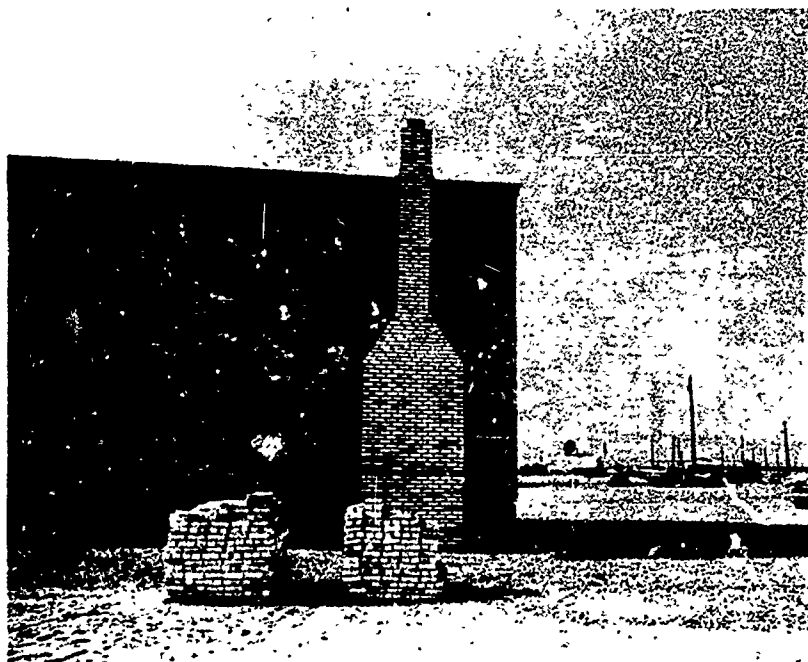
Exterior View of Doubledeck, 2S-5, prior to Part "B" Testing. Note That Brick Veneer Has Been Removed and Replaced by Redwood Siding. Note Also the New Brick Fireplace and Chimney.
